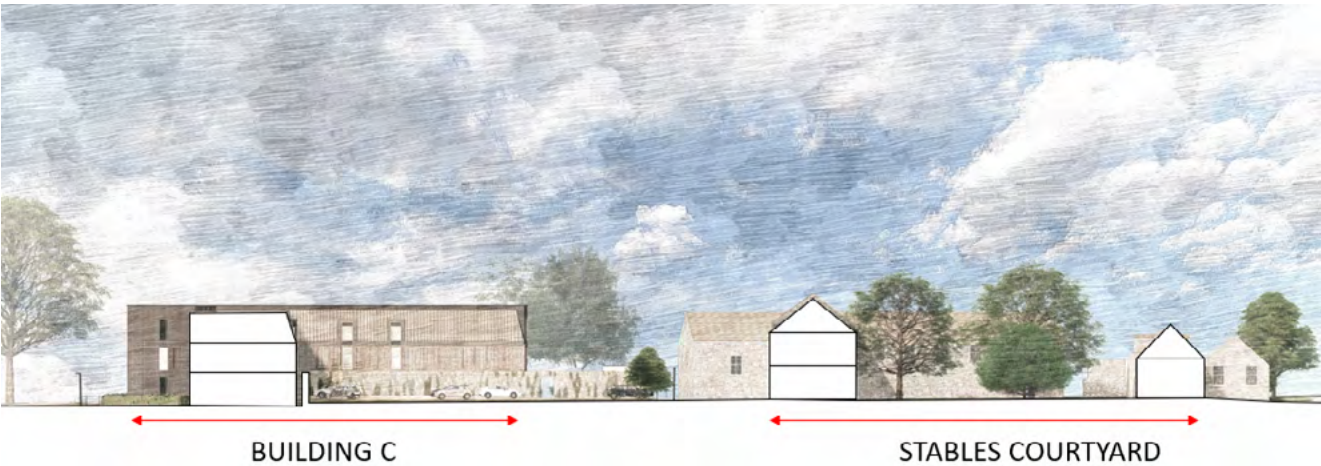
Building C on the boundary to ‘The Park’ at 3 storeys
